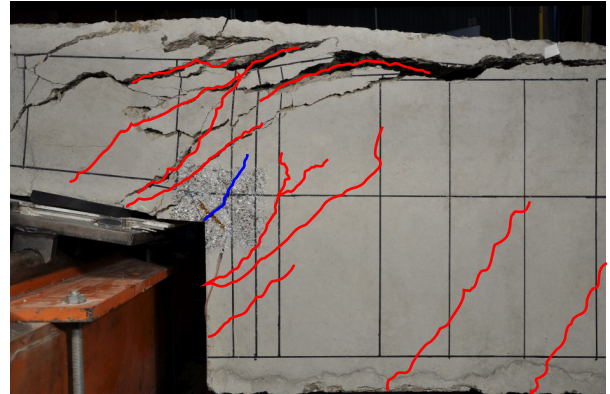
Example of application of spalling failure criteria for specimens DEB-1.6 and DEB-1.7.
